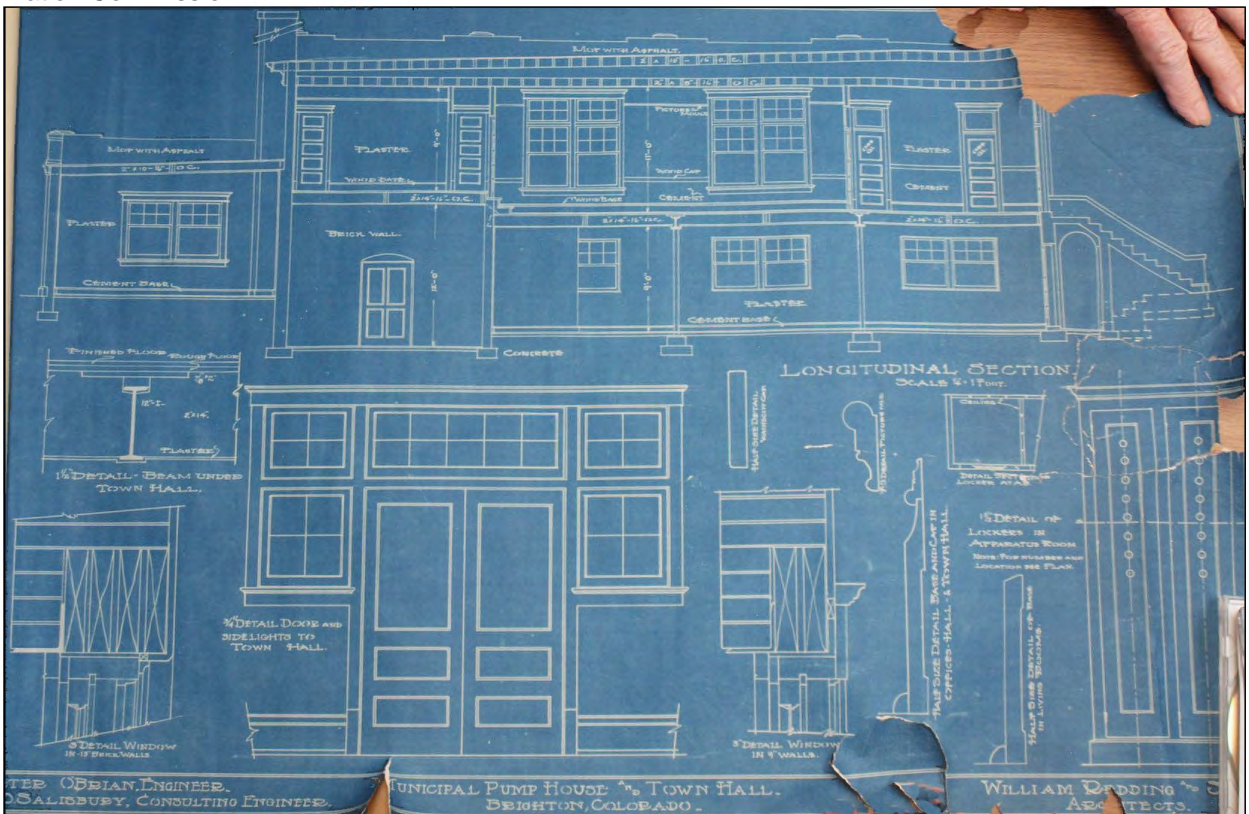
Elevation and details, 1918 blueprints, William Redding & Son, Architects. Source: City of Brighton, Historic Preservation Commission
